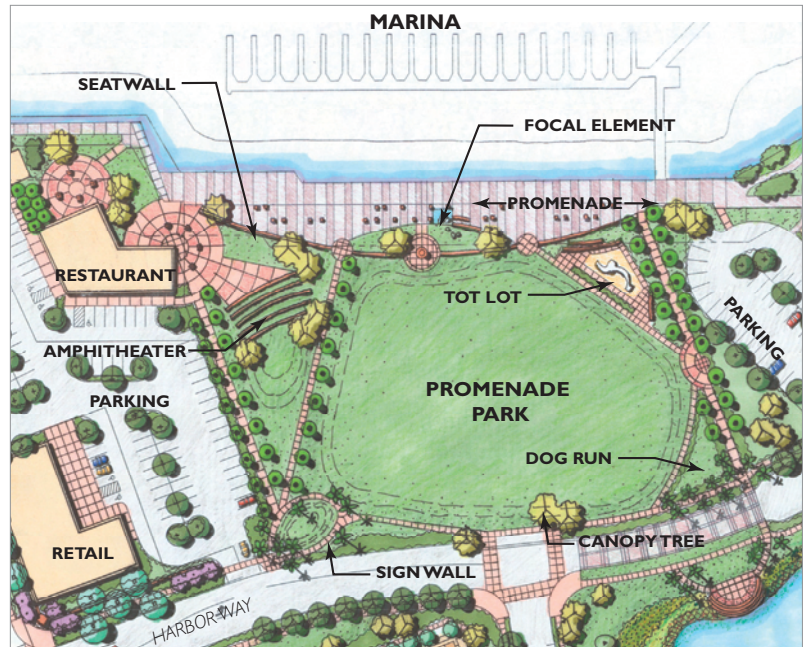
D.25: Illustrative Site Plan of Promenade Park
